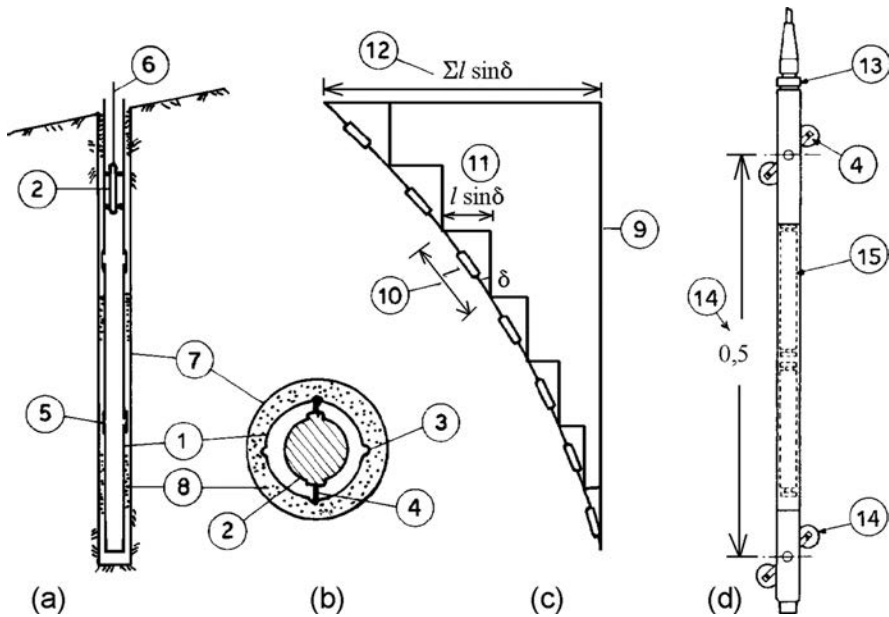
Inclinometer. (a) Vertical section; (b) horizontal section; (c) calculation of displacements; (d) probe with servo-accelerators. (1) Elastic tube; (2) probe with sensor; (3) groove; (4) wheels; (5) joints; (6) cable; (7) borehole; (8) grouted or filled with sand; (9) initial vertical profile; (10) distance between two subsequent readings; (11) displacement; (12) cumulative displacement; (13) plug; (14) measuring length, 50 cm; (15) servo-accelerator.
